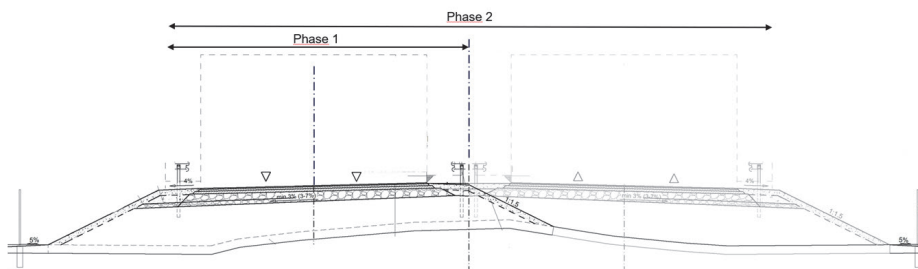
Express road under phased construction: in the first phase one carriageway is built and intersections with local roads are grade-separated
